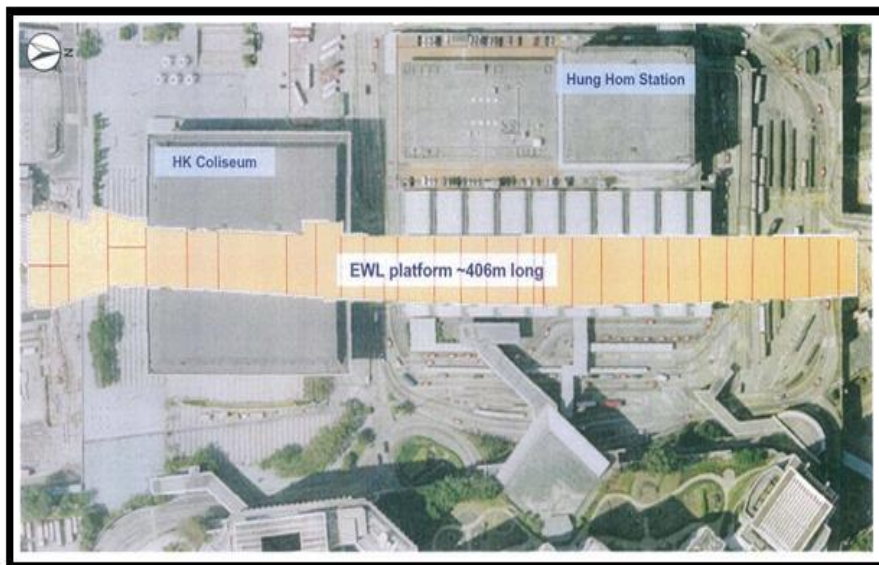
General layout plan of the EWL platform of the Hung Hom Station Extension
